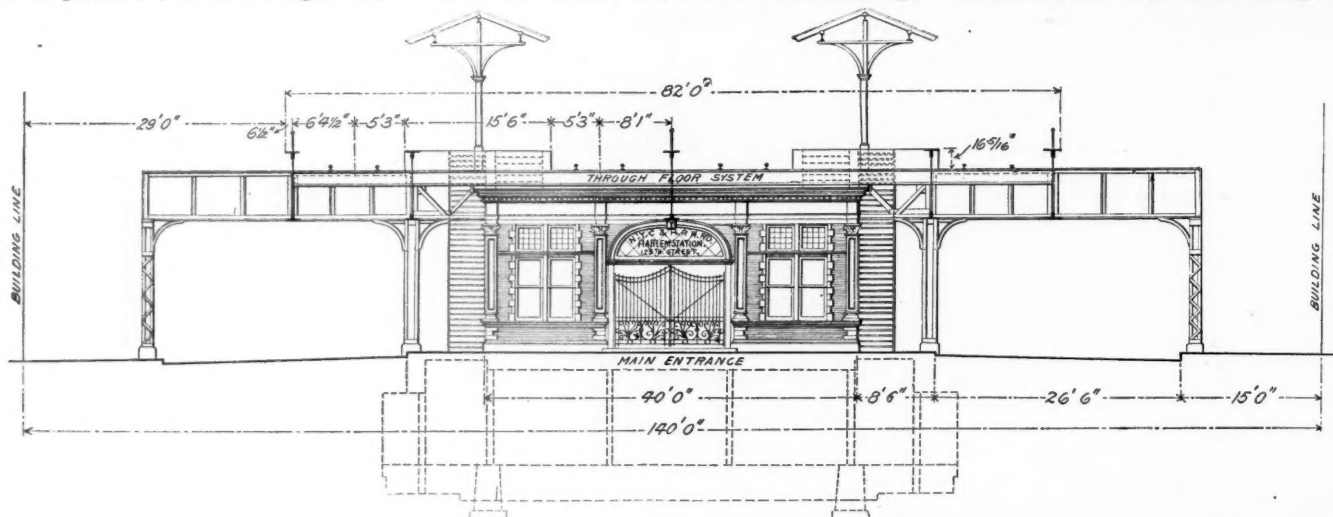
Front Elevation of New York Central Station at 125th Street.
